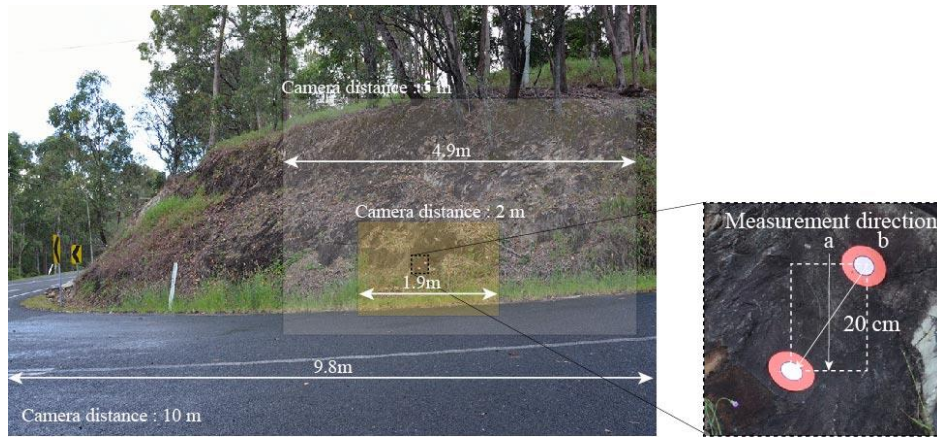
Study slope and measurement section (Site #1. Beaudesert Nerang road)
